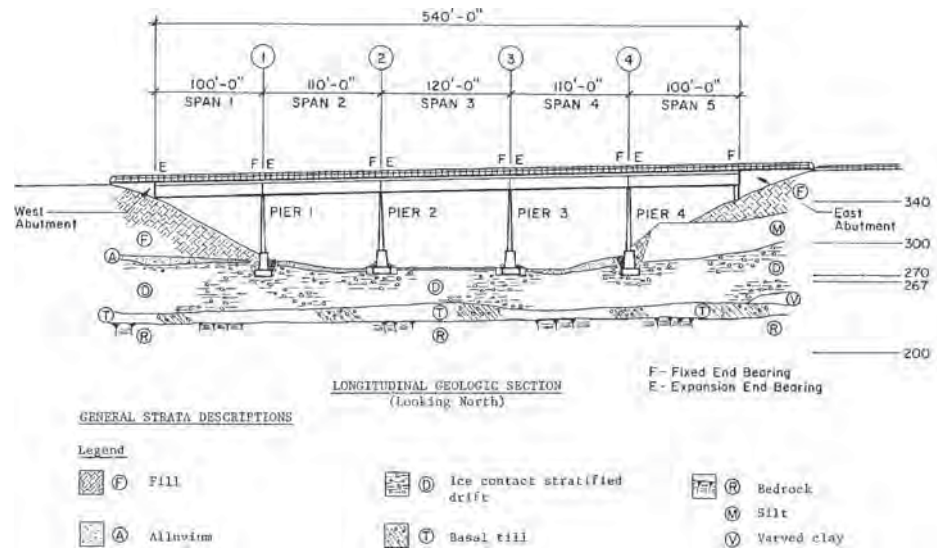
South elevation of Schoharie Creek bridge showing key structural features and a schematic geological section.
